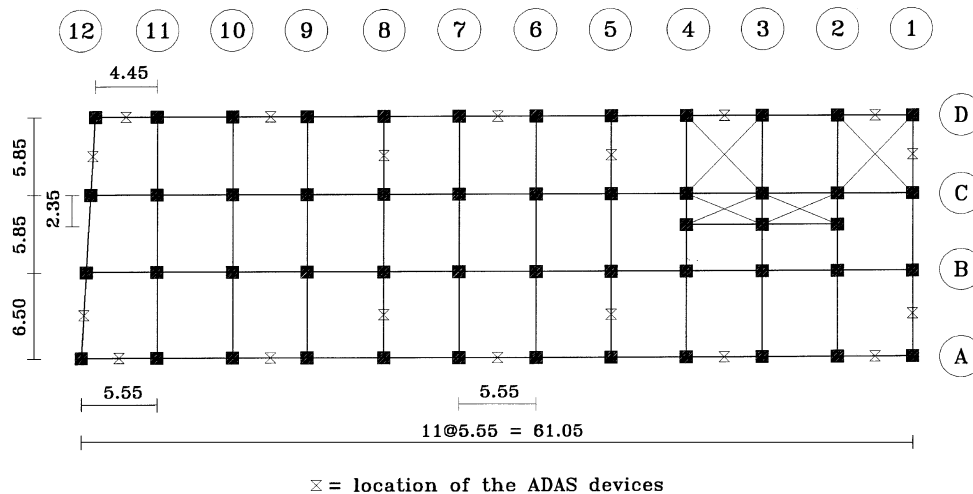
Plan view of the alternate ADAS retrofit (dimensions in meters)
